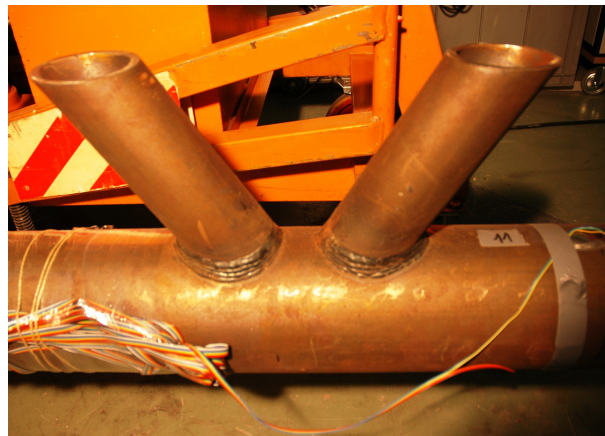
Particular joint with part of braces welded on the lower chord (specimen S6, joint 2-3S).
